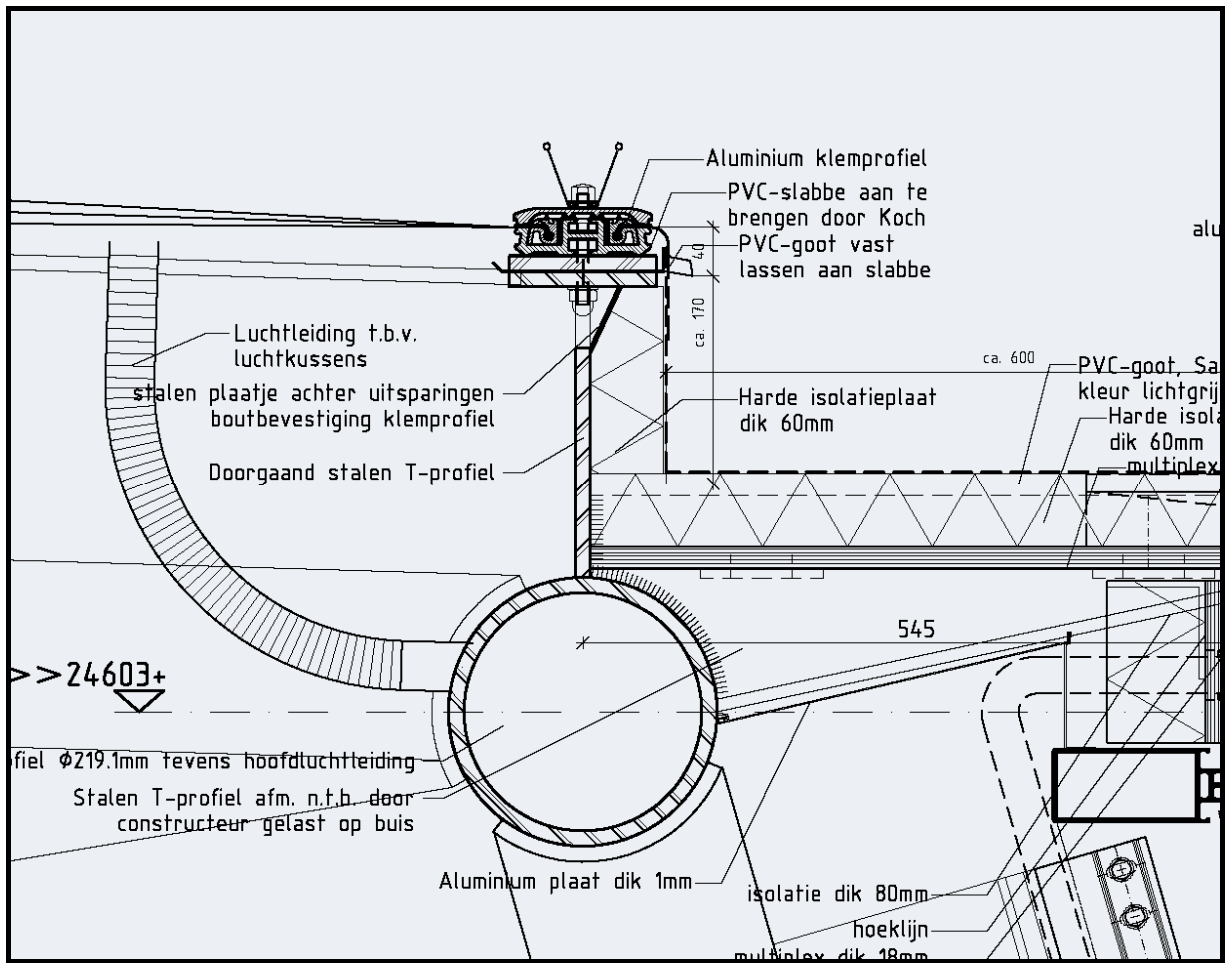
Details of Arena Center, Halle, Amsterdam (Arch: Benthem Crouwel)
